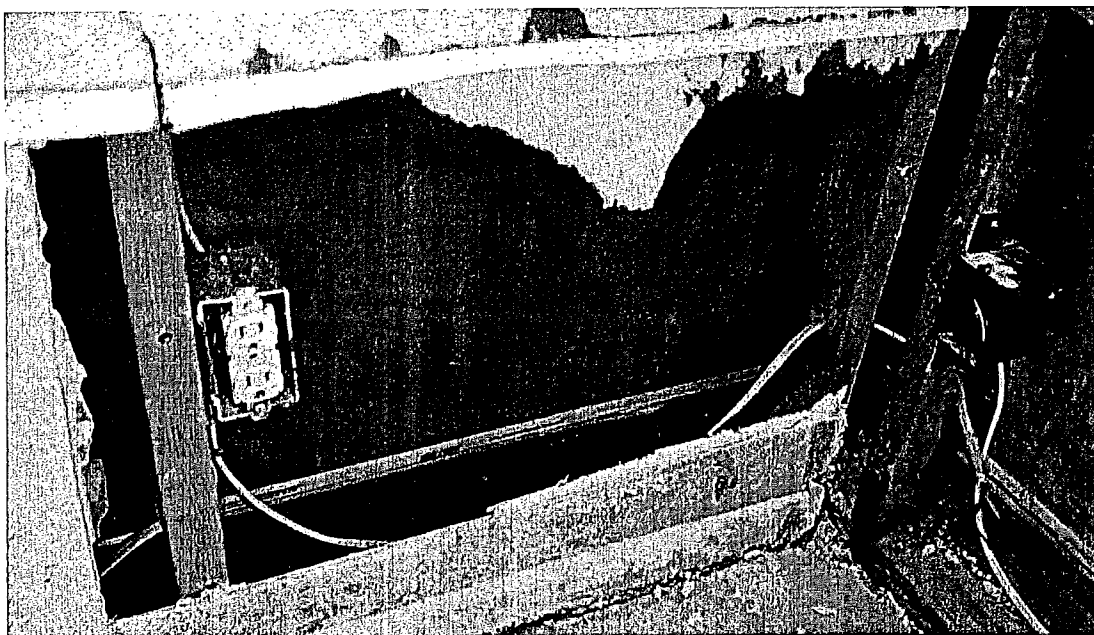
North end of west wall opened to show routing and termination of remaining portion of damaged romex segment.
